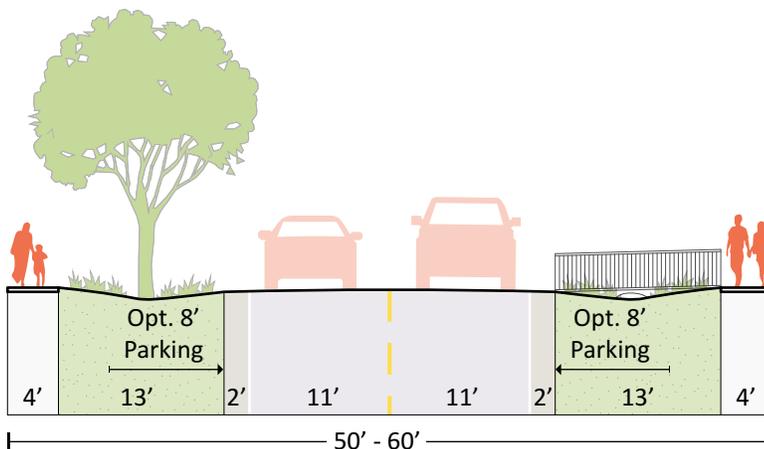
E (1). 'B' Street - Residential (Long-term).
